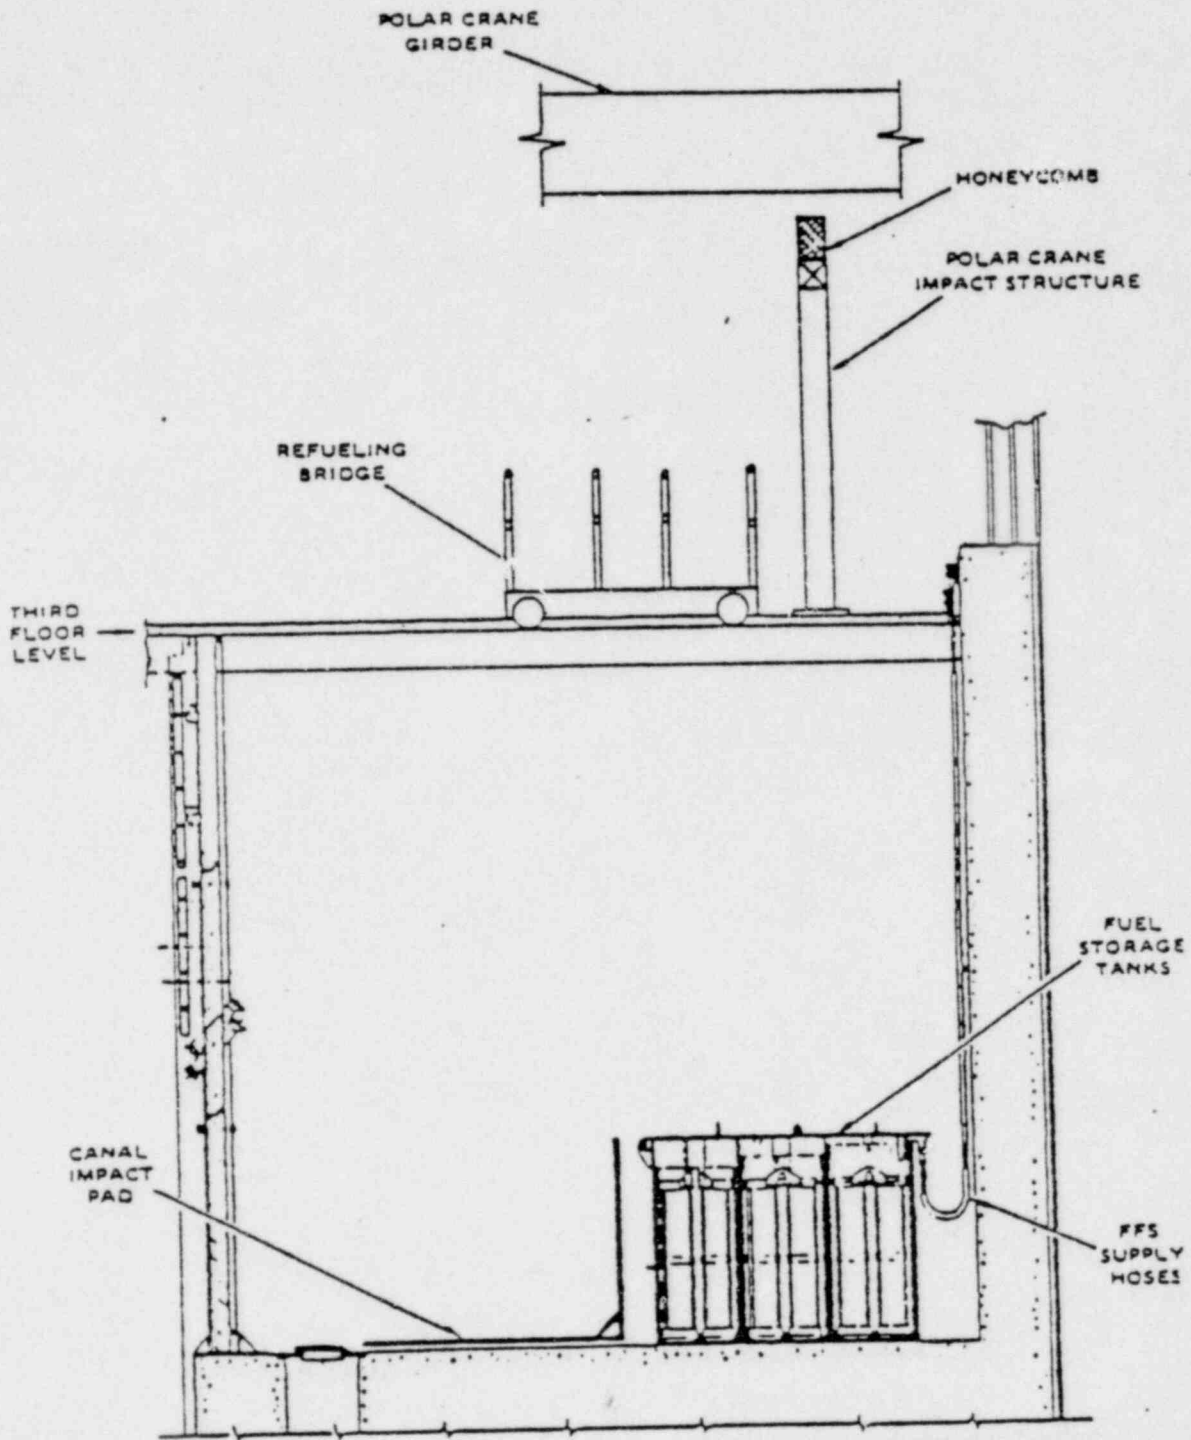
Elevation of Canal Area Showing Polar Crane Impact Structure with Honeycomb Bed
